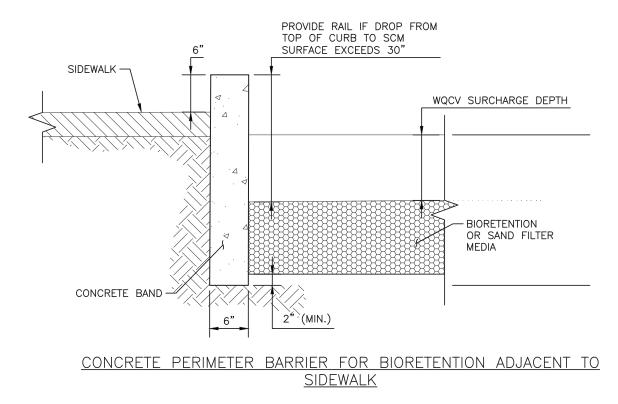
CONCEPTUAL DETAILS FOR CONCRETE PERIMETER BARRIERS SECTION VIEW (NOT TO SCALE)
